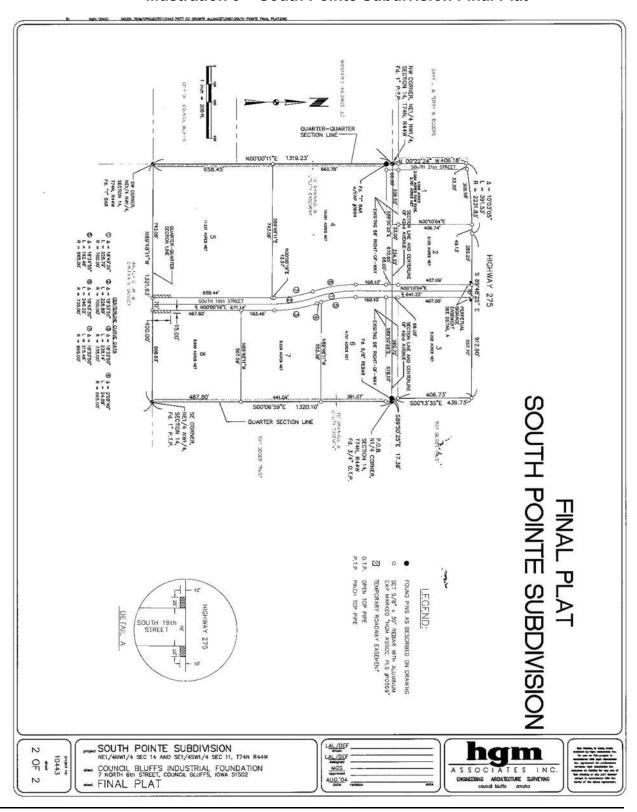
South Pointe Subdivision, Phase 2 Final Plat
